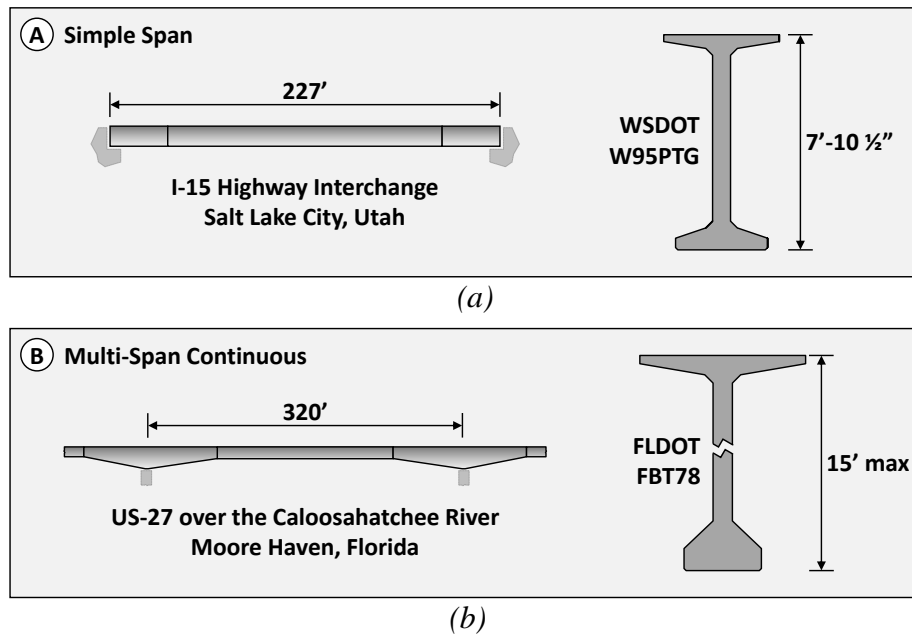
Examples of the application of spliced girder technology – (a) simple span;
